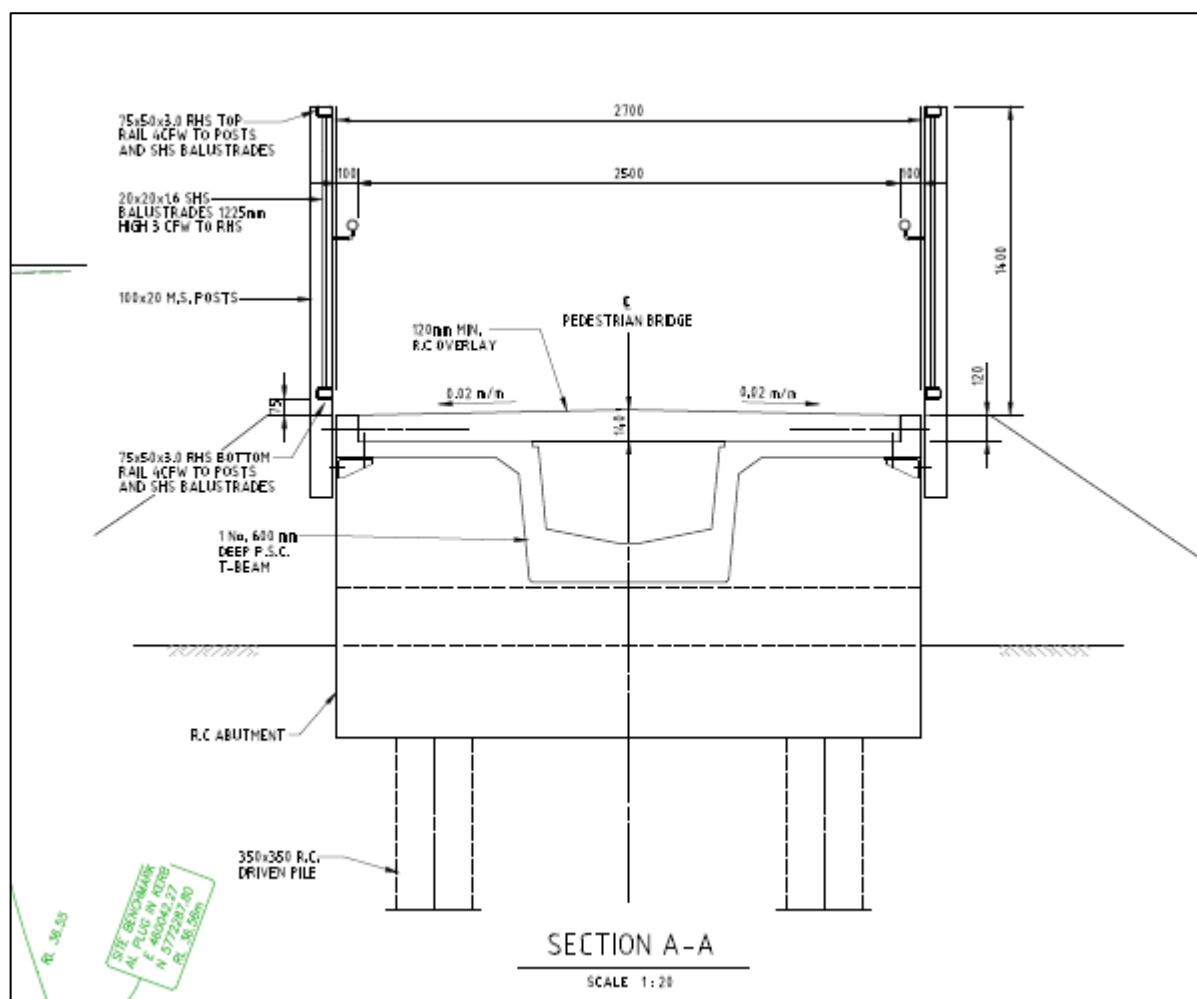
Typical view of the abutment layout. Source - document No. 50925 – LCC (VICTORY PARK) – CONCEPT GA
